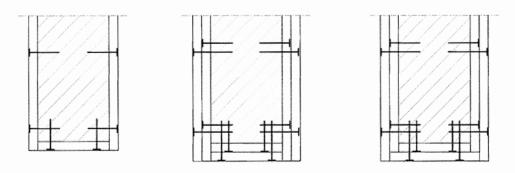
Examples of fixing of fire protective panels to beams or columns
